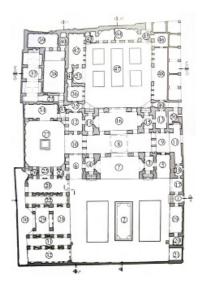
First Floor Plan of Amini Khaneh-Hussainia (Mohamadzadeh et al., 2007)
